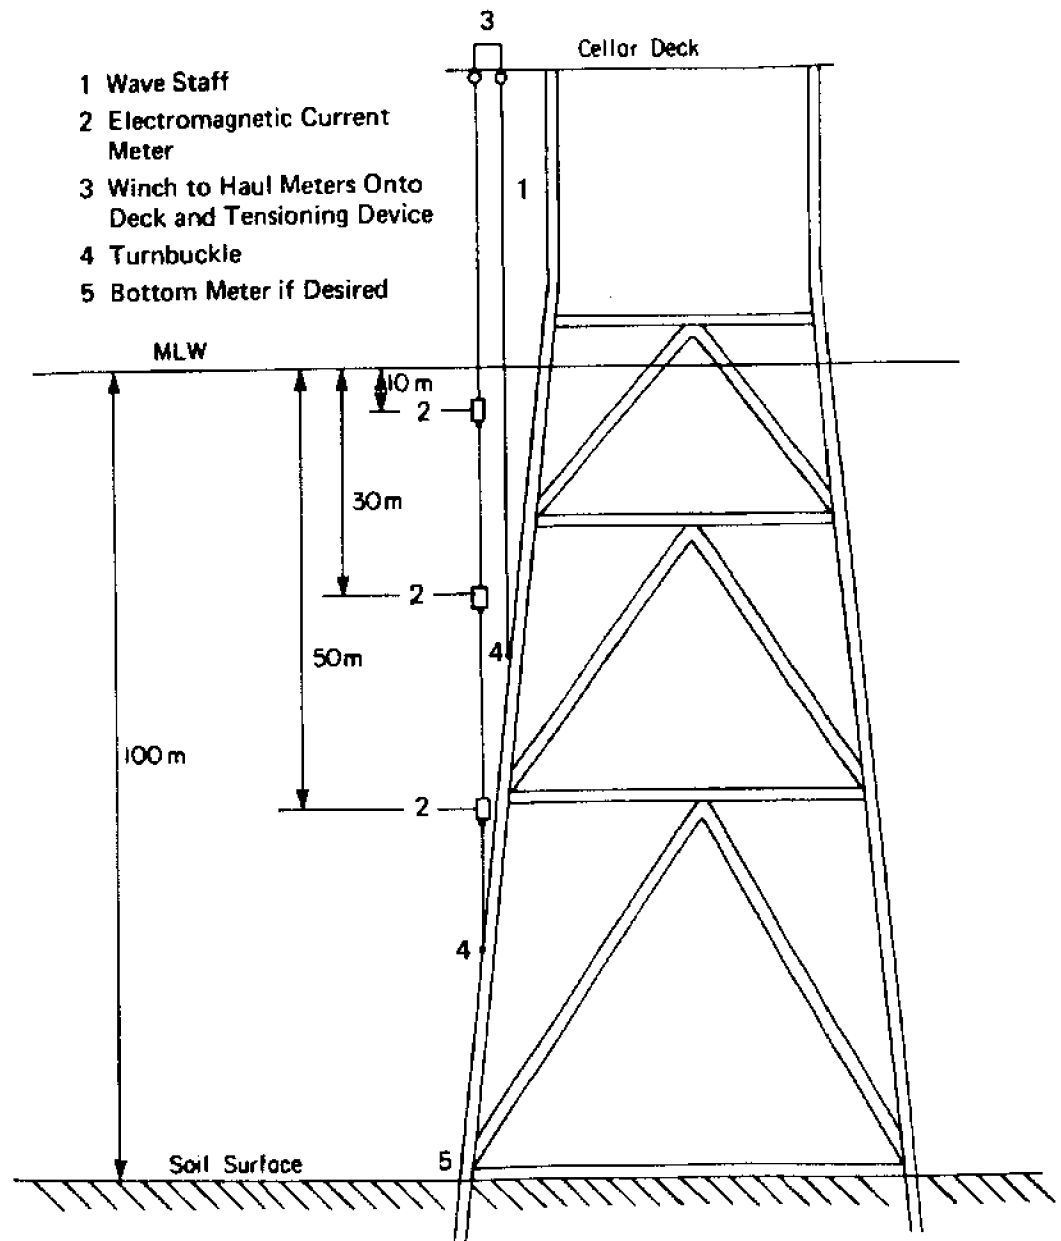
Typical Platform Instrumentation Mounting Scheme.
